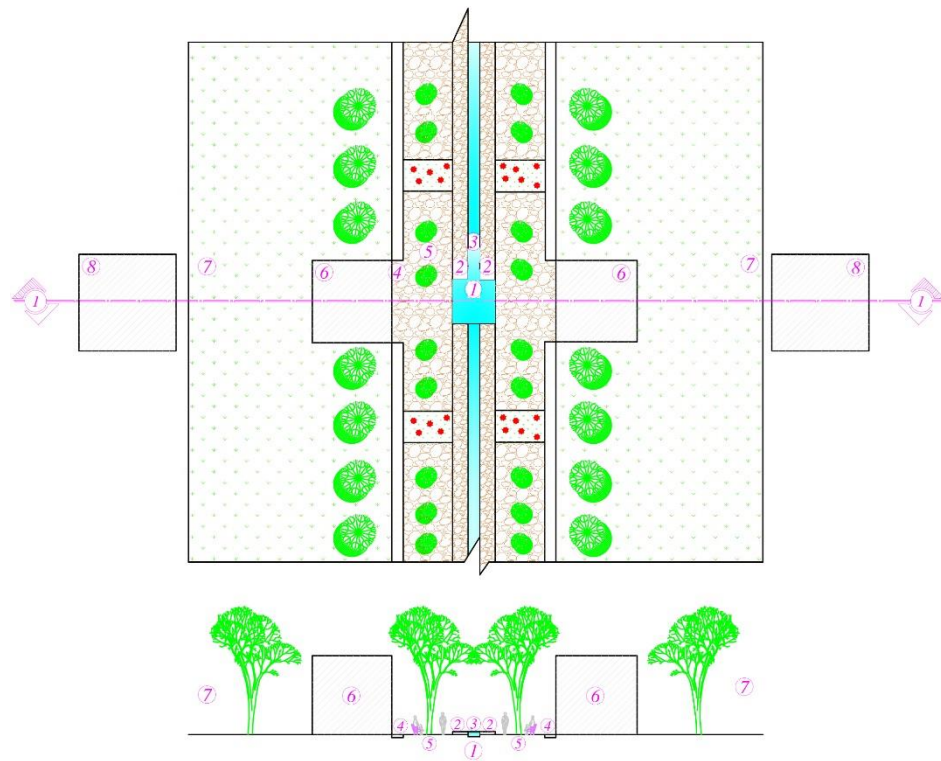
Plan and section from Chahar Bagh's Avenue based on Chardin explanation (Author: 2015)
